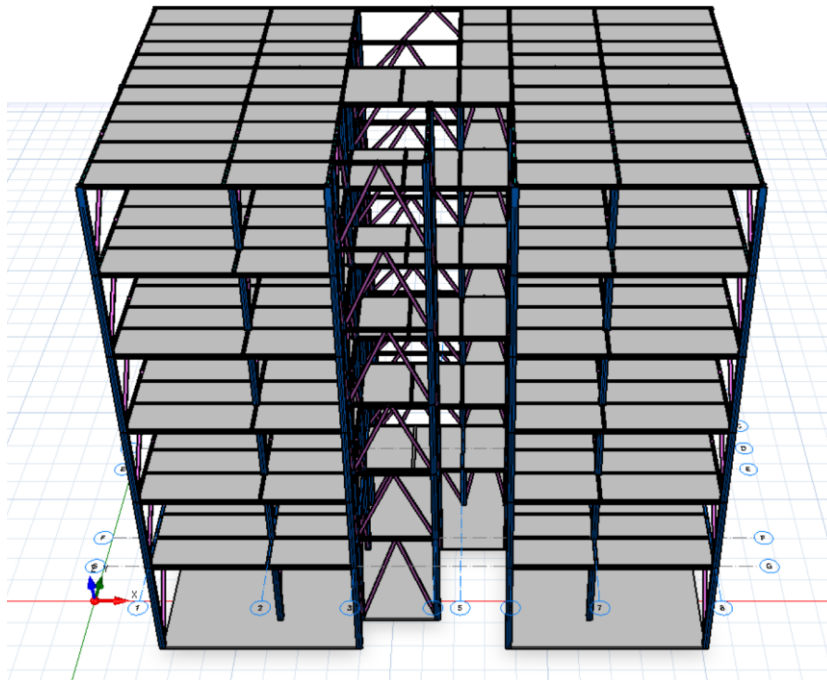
SS5 Model (Steel Model - 5 Floors with 1 Basement)
